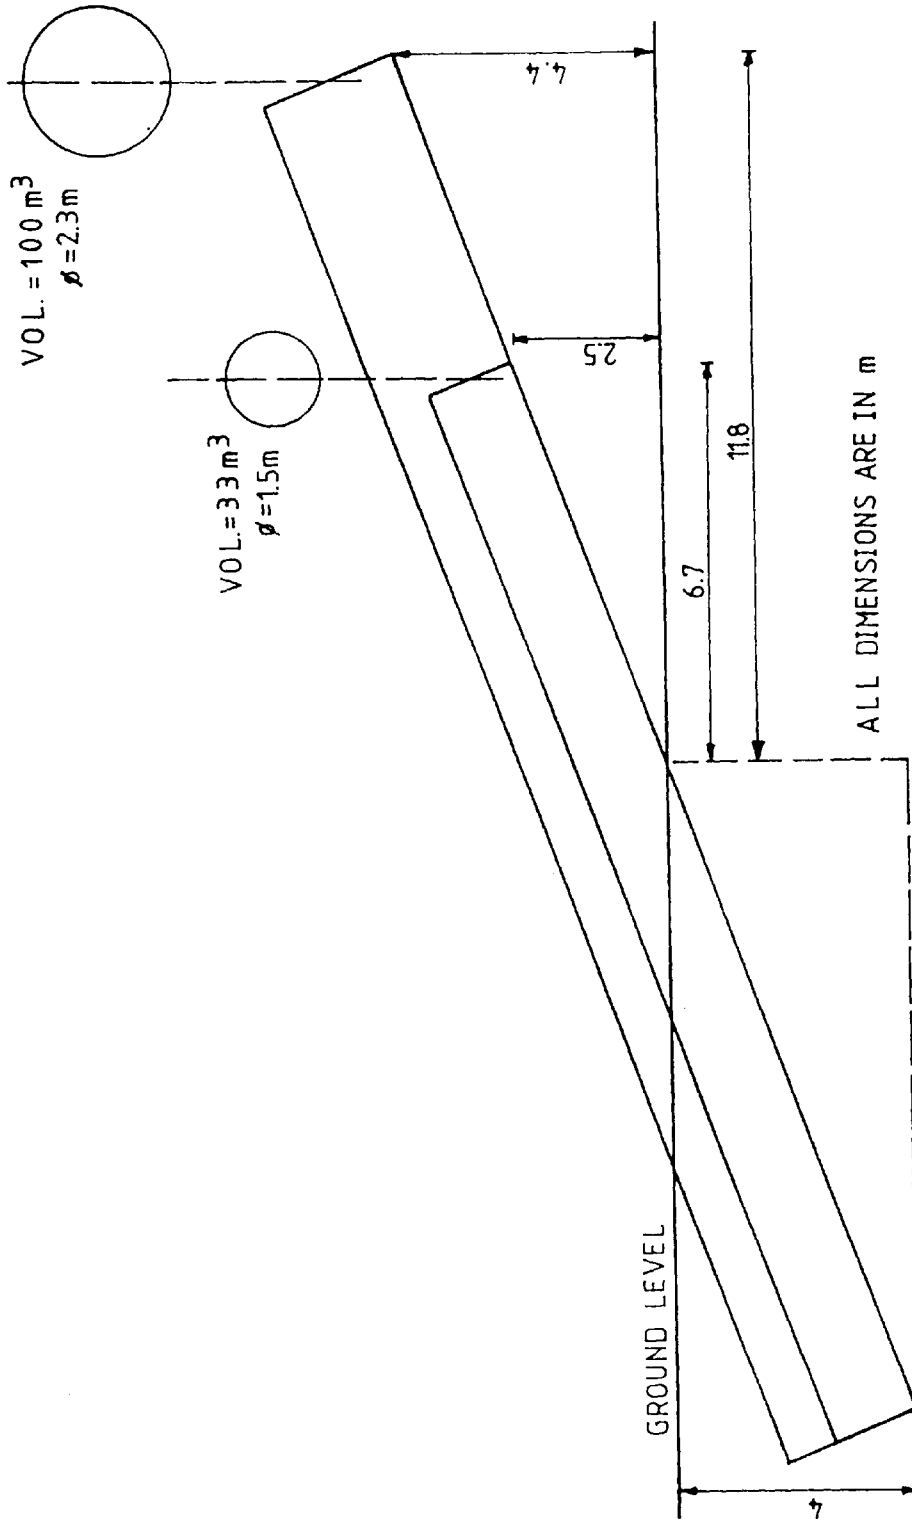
Scale drawing of partly buried inclined tubular digesters.
